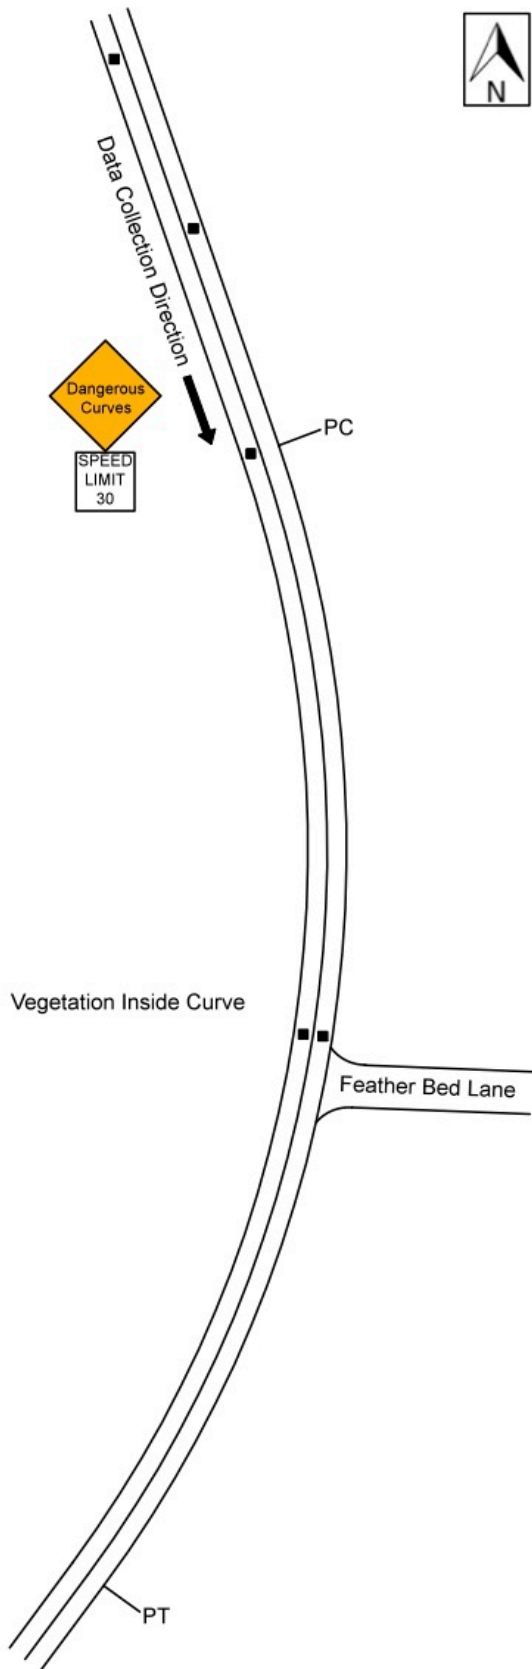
Diagram. Geometric layout of southbound Braley Hill Road (not to scale).
